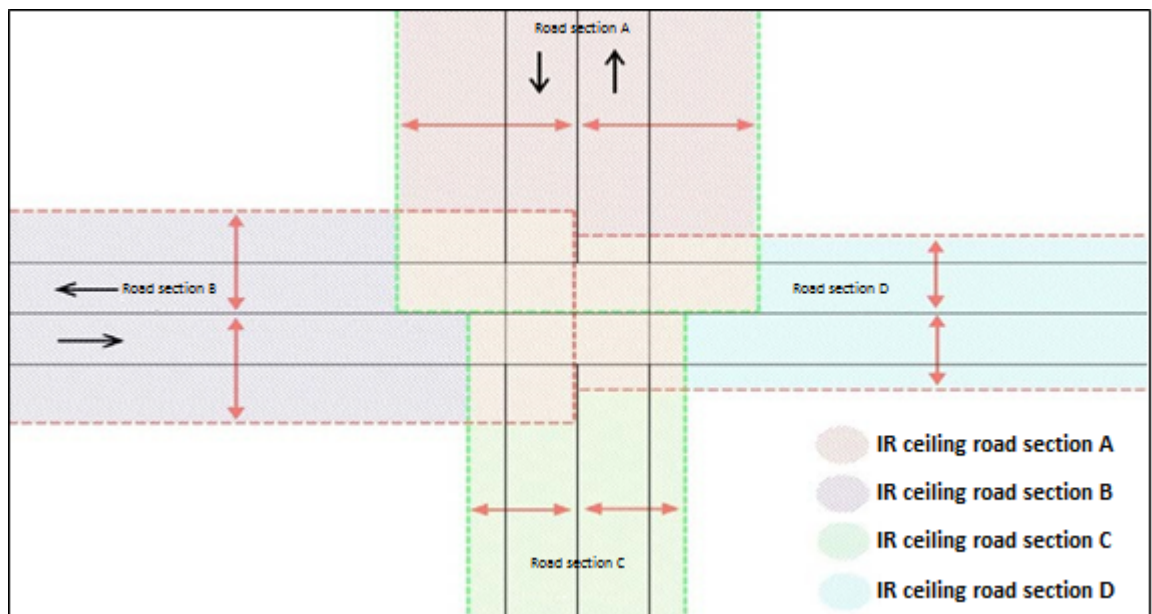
Start and end for a road section at a crossroads with crossing carriageways
